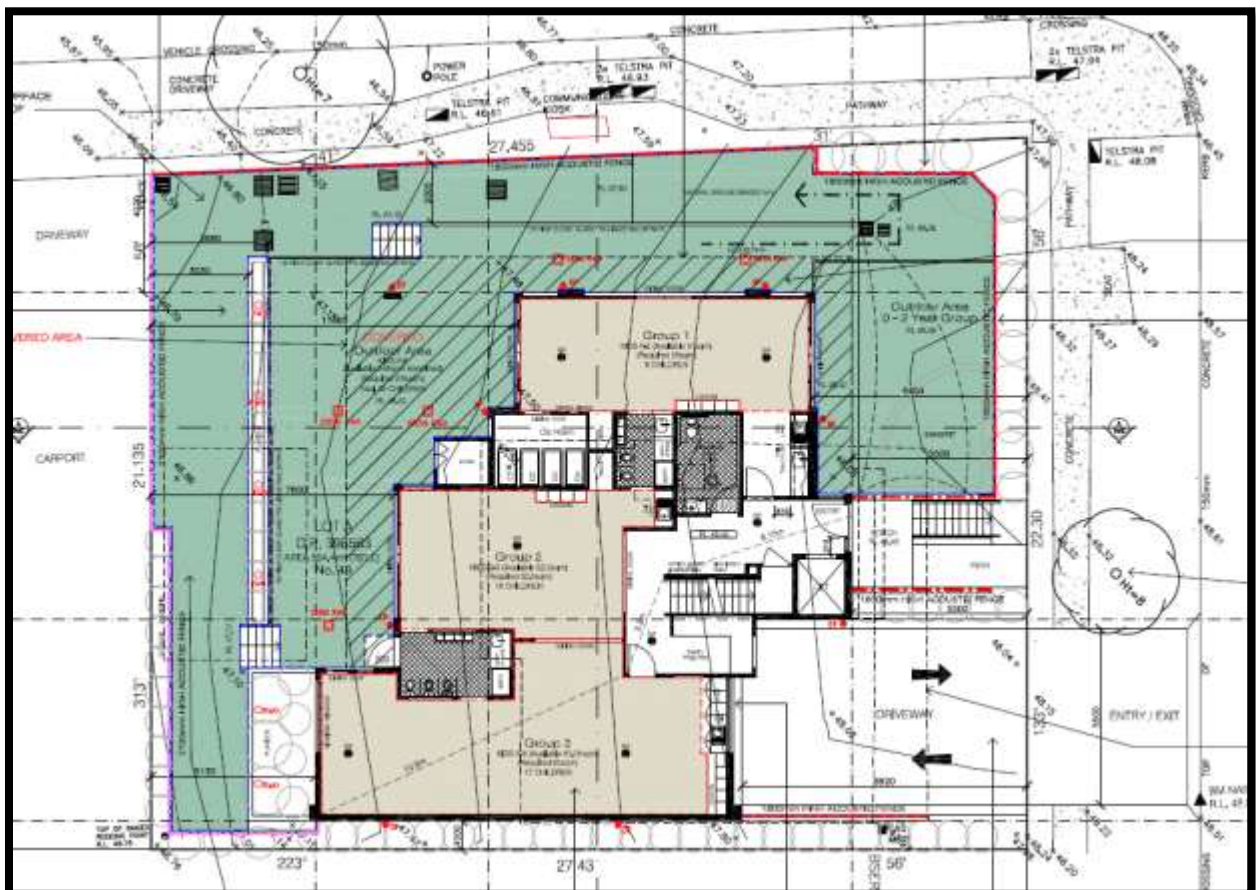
Site Plan at 49 Jersey Avenue Mortdale (Source – NDGroup Architects)
